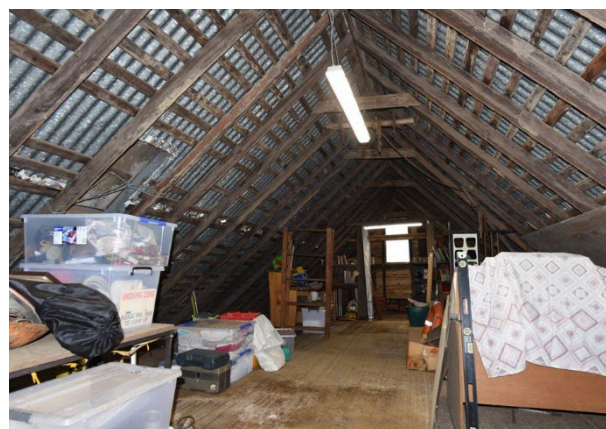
27: Shingle battens with corrugated iron roof cladding to barn at No. 353 Pitt Town Bottoms Road, Pitt Town Bottoms
